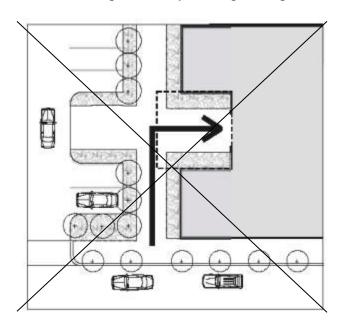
(B): Example of connection of building entrance which is not located on a street but has a clear pedestrian walkway to it.
